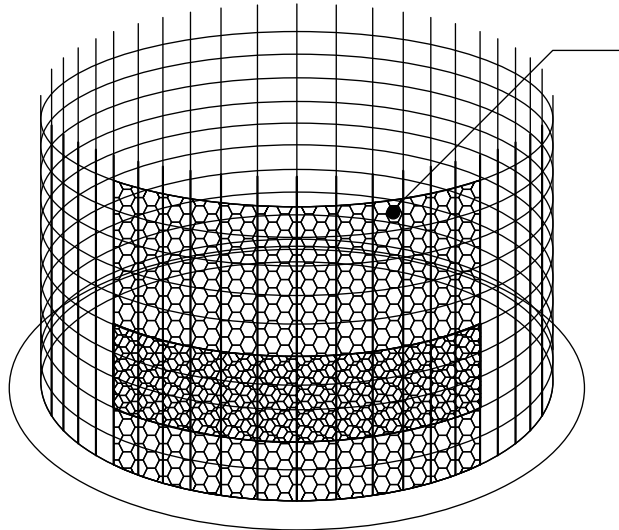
Wire Mesh Wrapped Around the Stiff Wire Frame.
